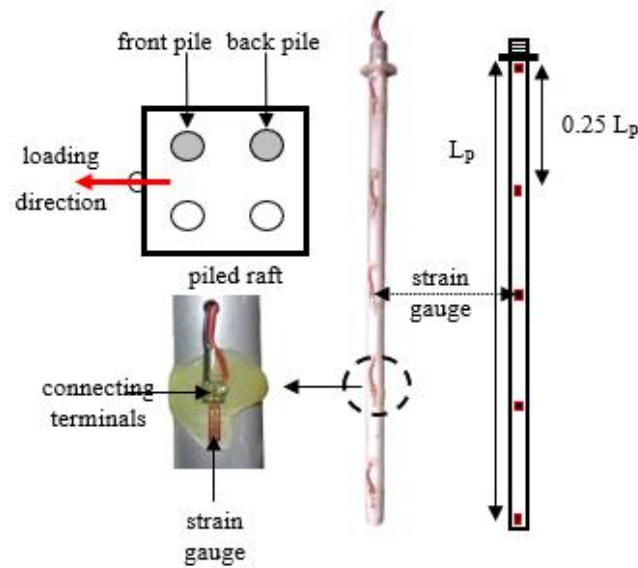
Instrumented pile in piled raft subjected to lateral load.
